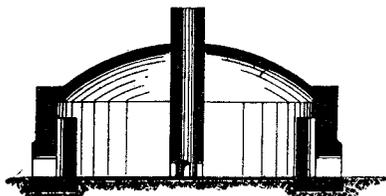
Down-draft, center stack, solid floor kiln, showing location of bag walls. (After Lovejoy.)
